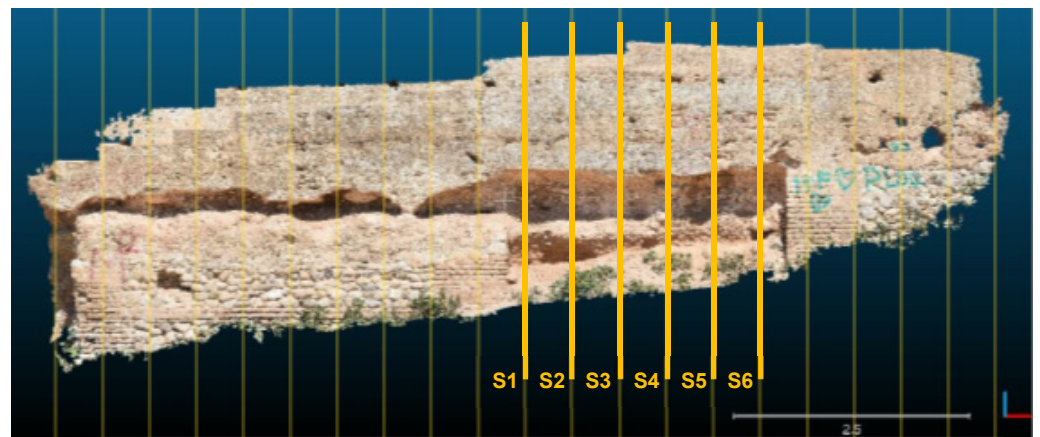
Photogrammetric reconstruction of the studied sement of the Zirid Wall. Location of reference sections.
